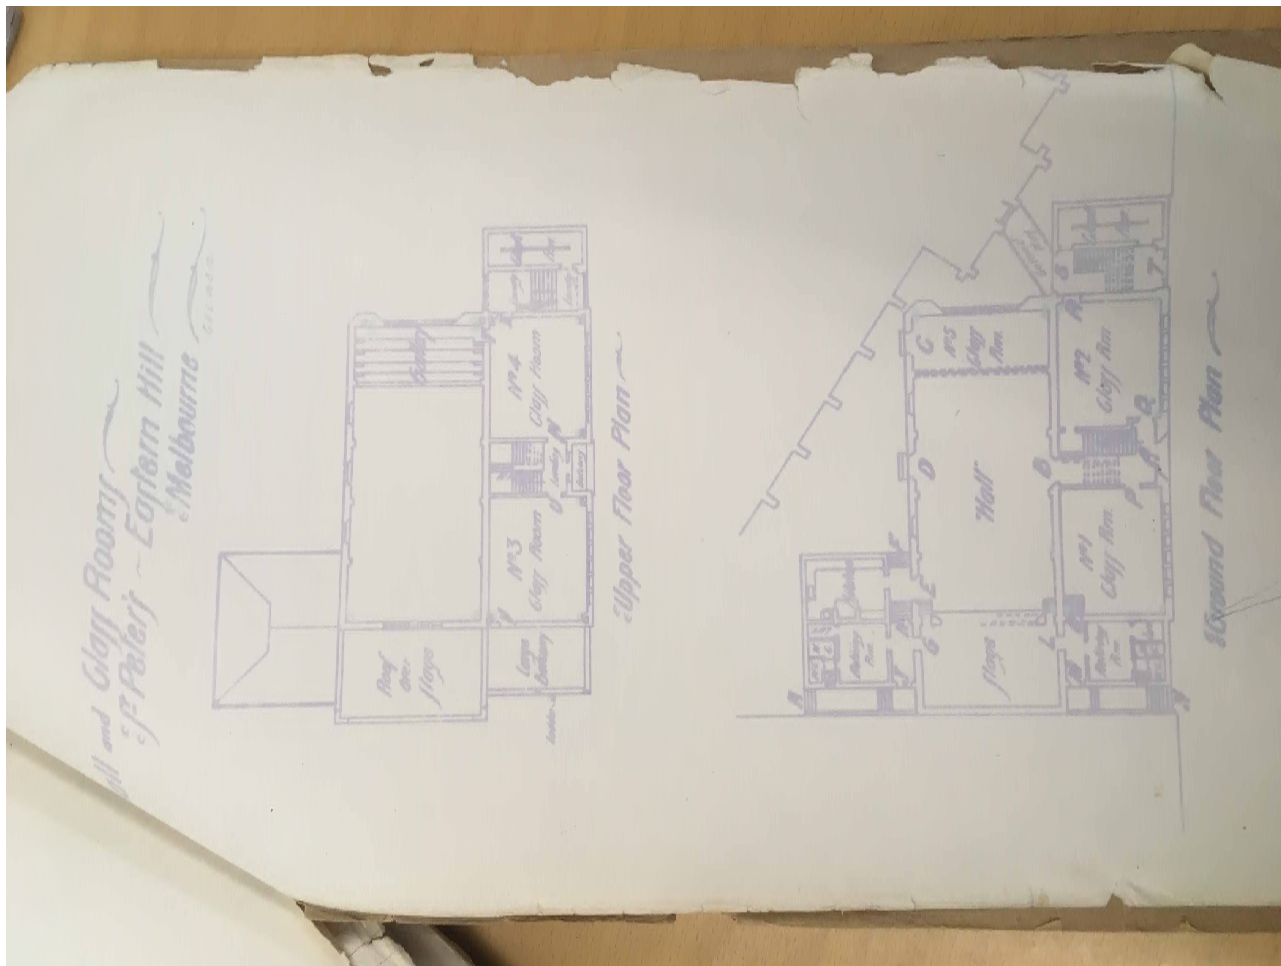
Floor plans from the Health Department dated 1912 show the original internal layout
